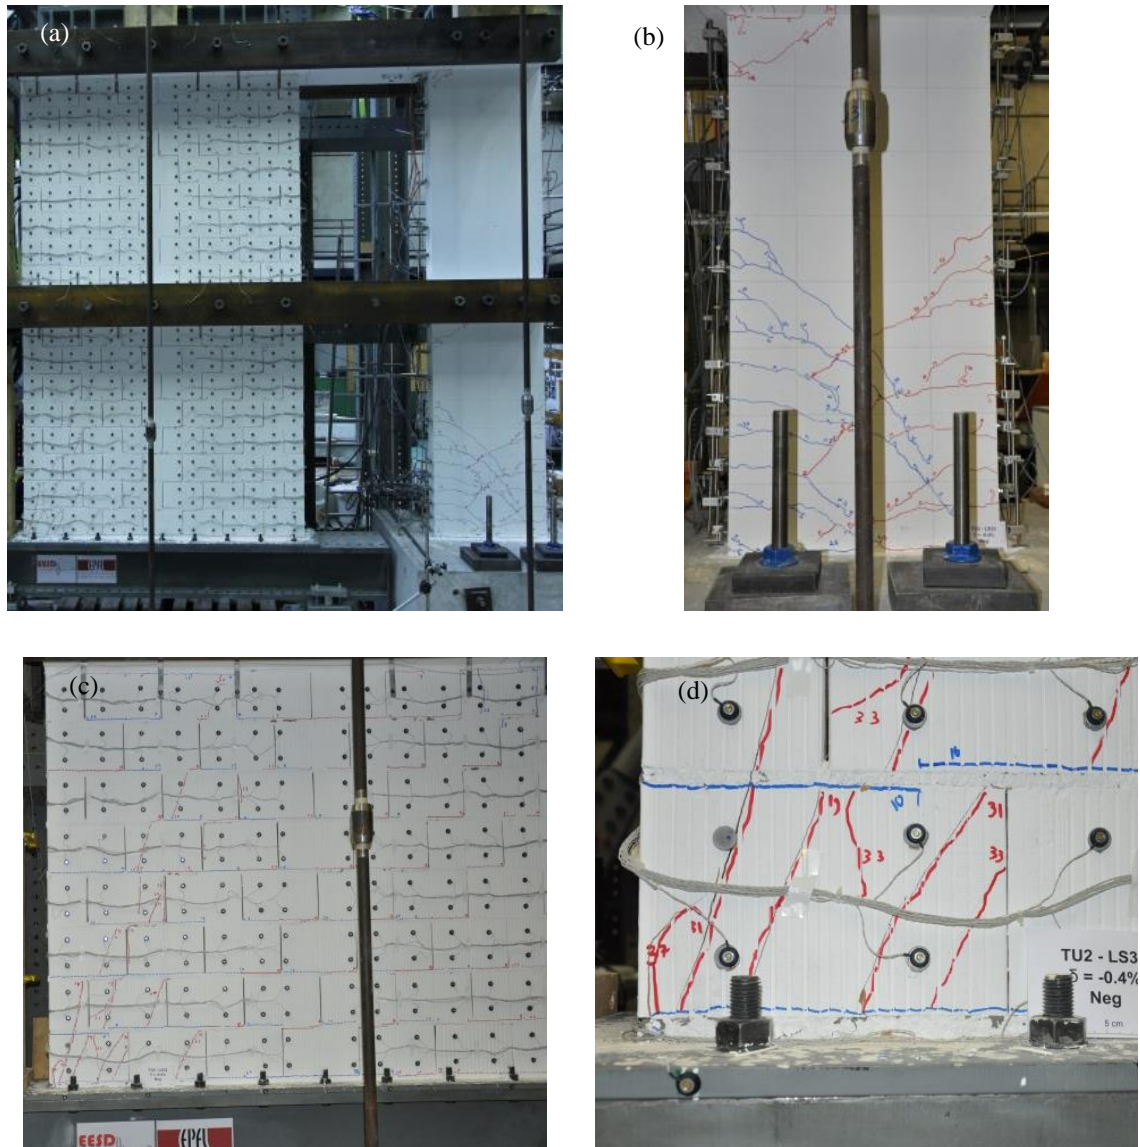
Crack pattern at LS33, $\delta = -0.4\%$. (a) specimen; (b, c) crack pattern at the bottom storey of the RC and URM wall; (d) compressed corner of the first storey of the URM wall.
